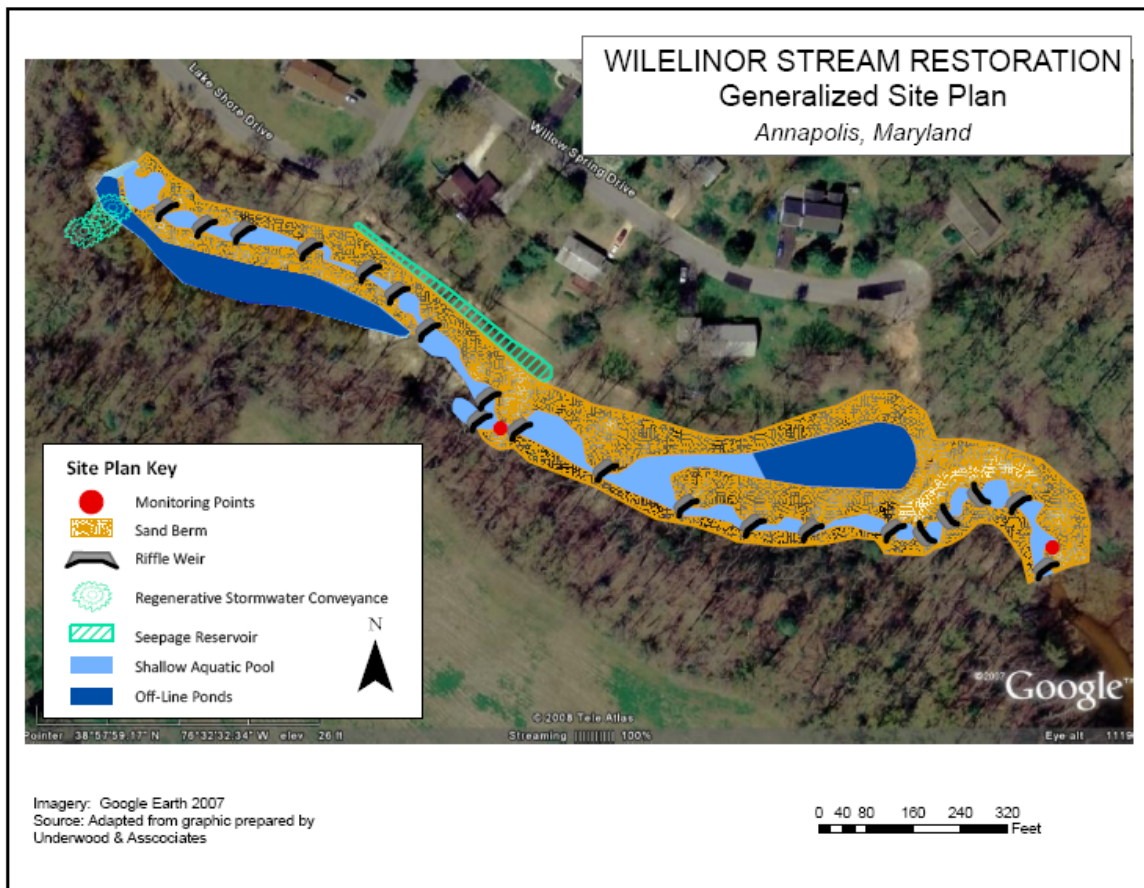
Wilelinor Stream Restoration Generalized Site Plan
